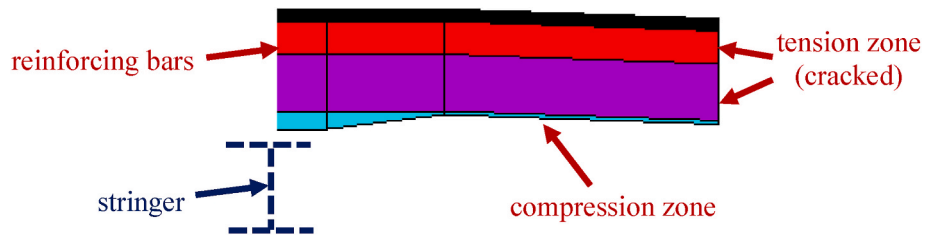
Modelling concept of reinforced concrete slab in the outer span.
